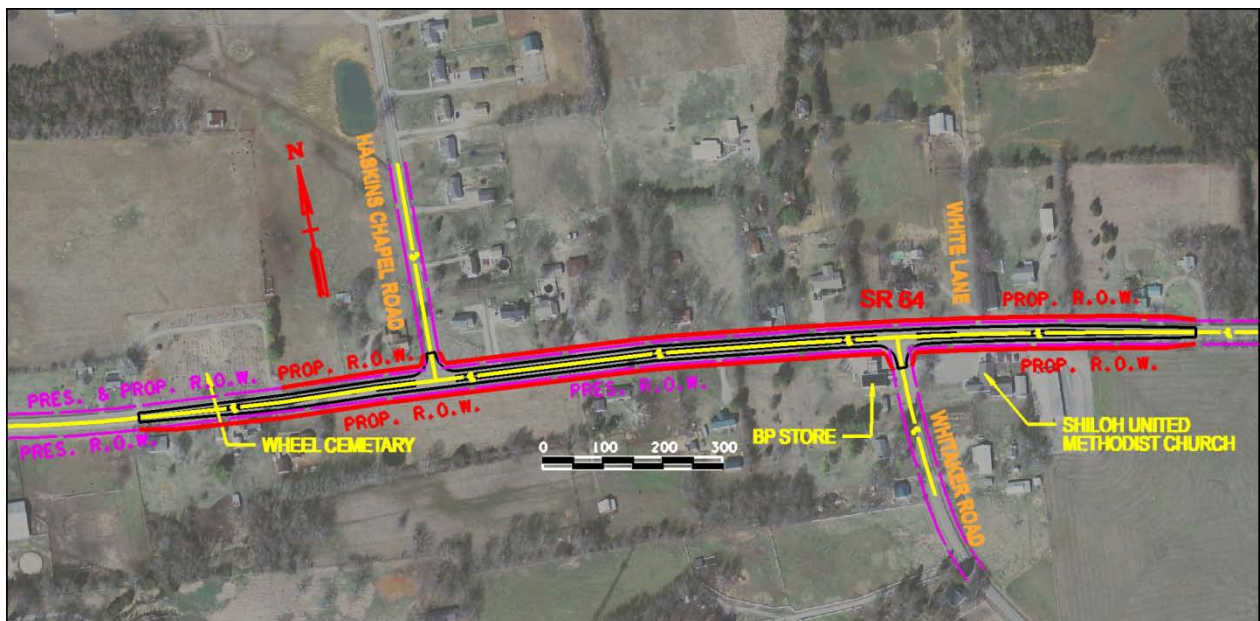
Plan View of Center Turn Lane From Haskins Chapel Road to Whitaker Road
